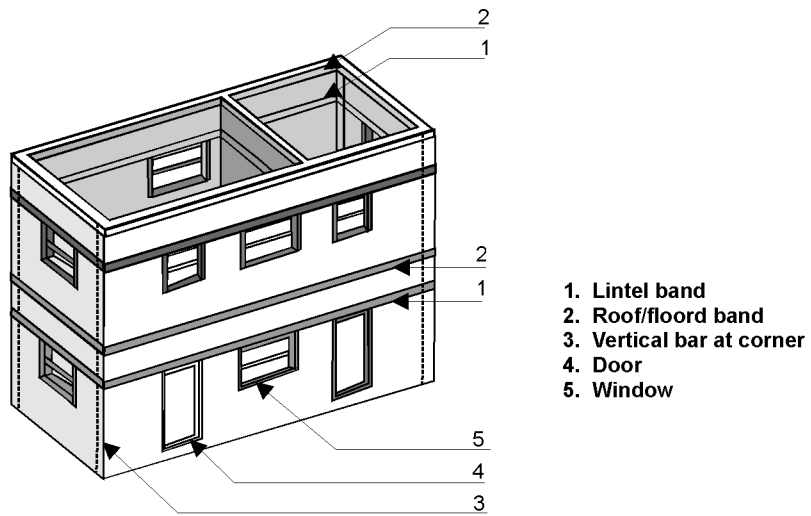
B Overall arrangement of reinforcing in masonry double storey building
